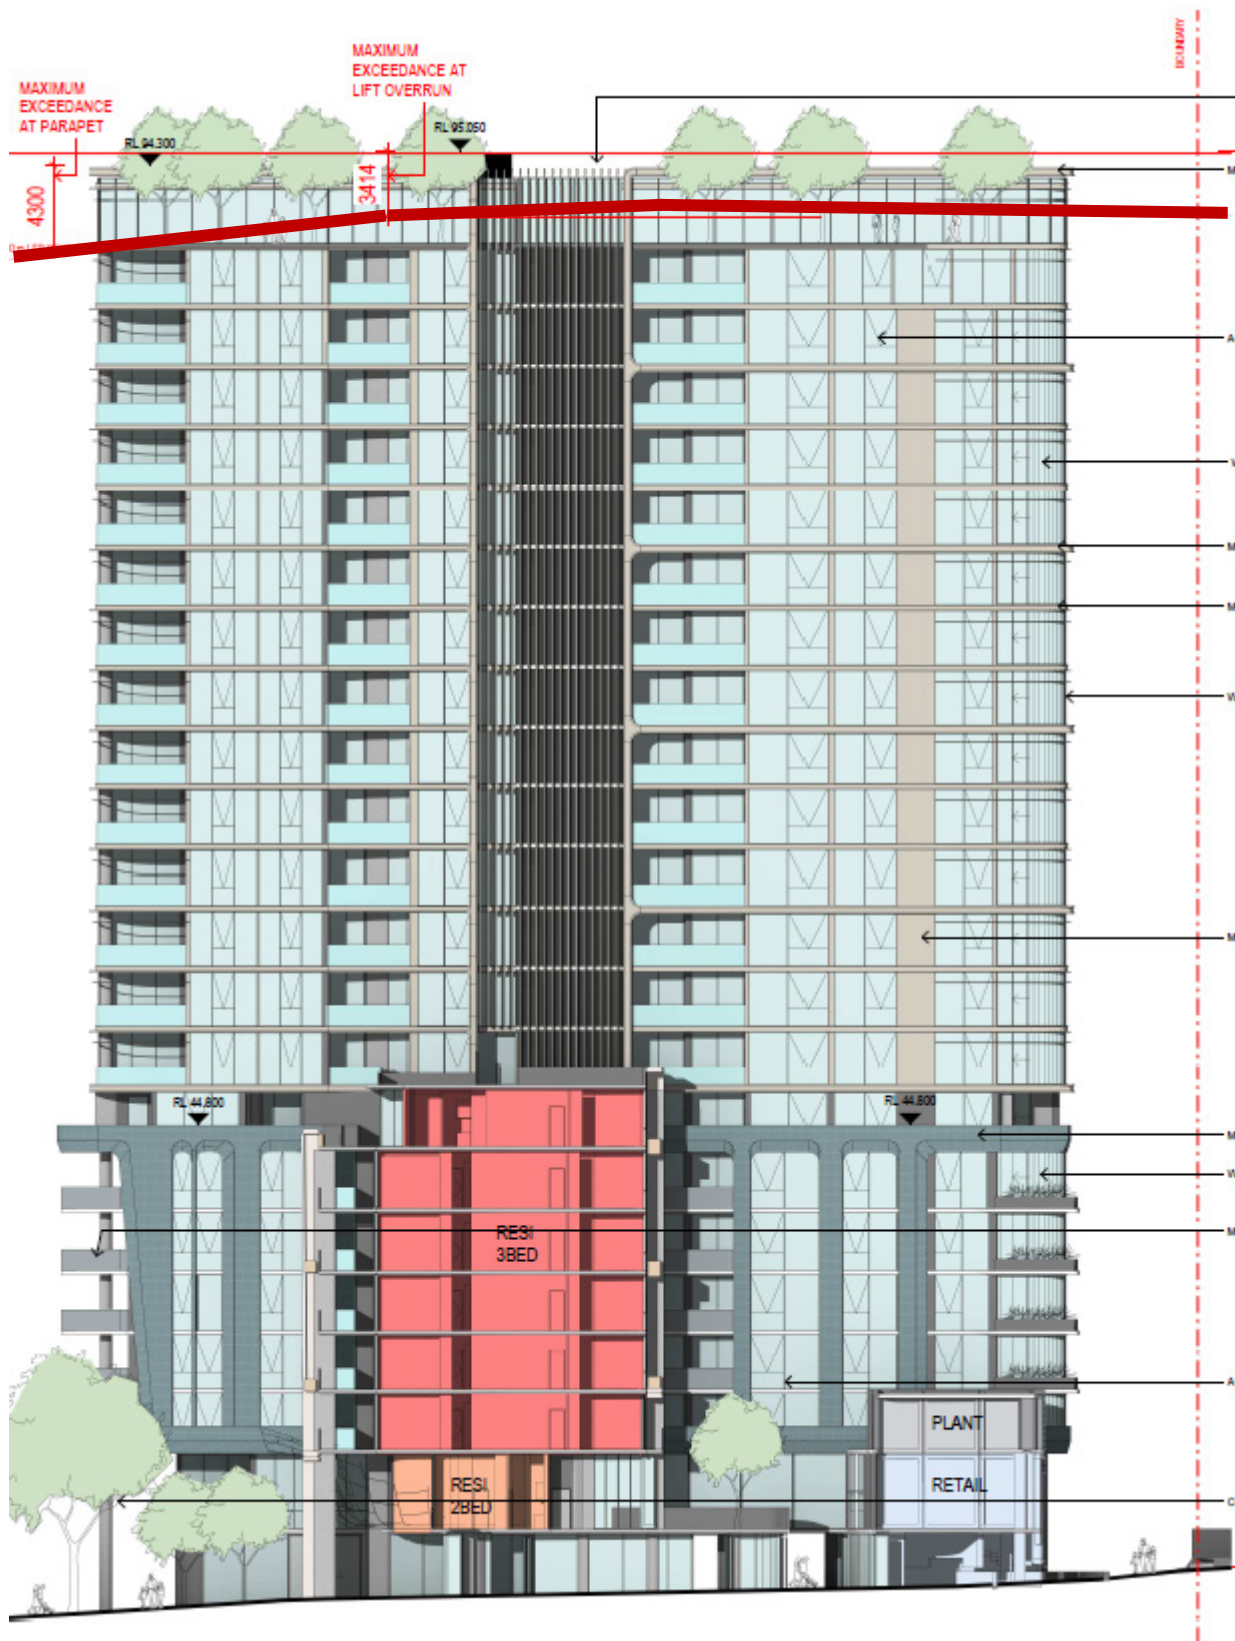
Building A – Elevation with 70m height plane (highlighted in dark red)
